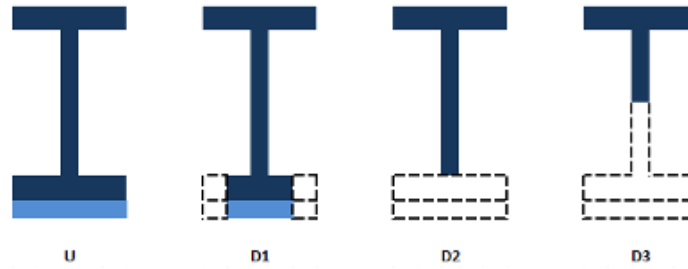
Cross-Section of Damaged Bridge Girder at Damage Location: undamaged (U): 50% reduction in the bottom flange and cover plate (D1): 100% reduction in the bottom flange and cover plate (D2): and 100% reduction in the bottom flange and cover plate and 50% reduction of the web (D3).
